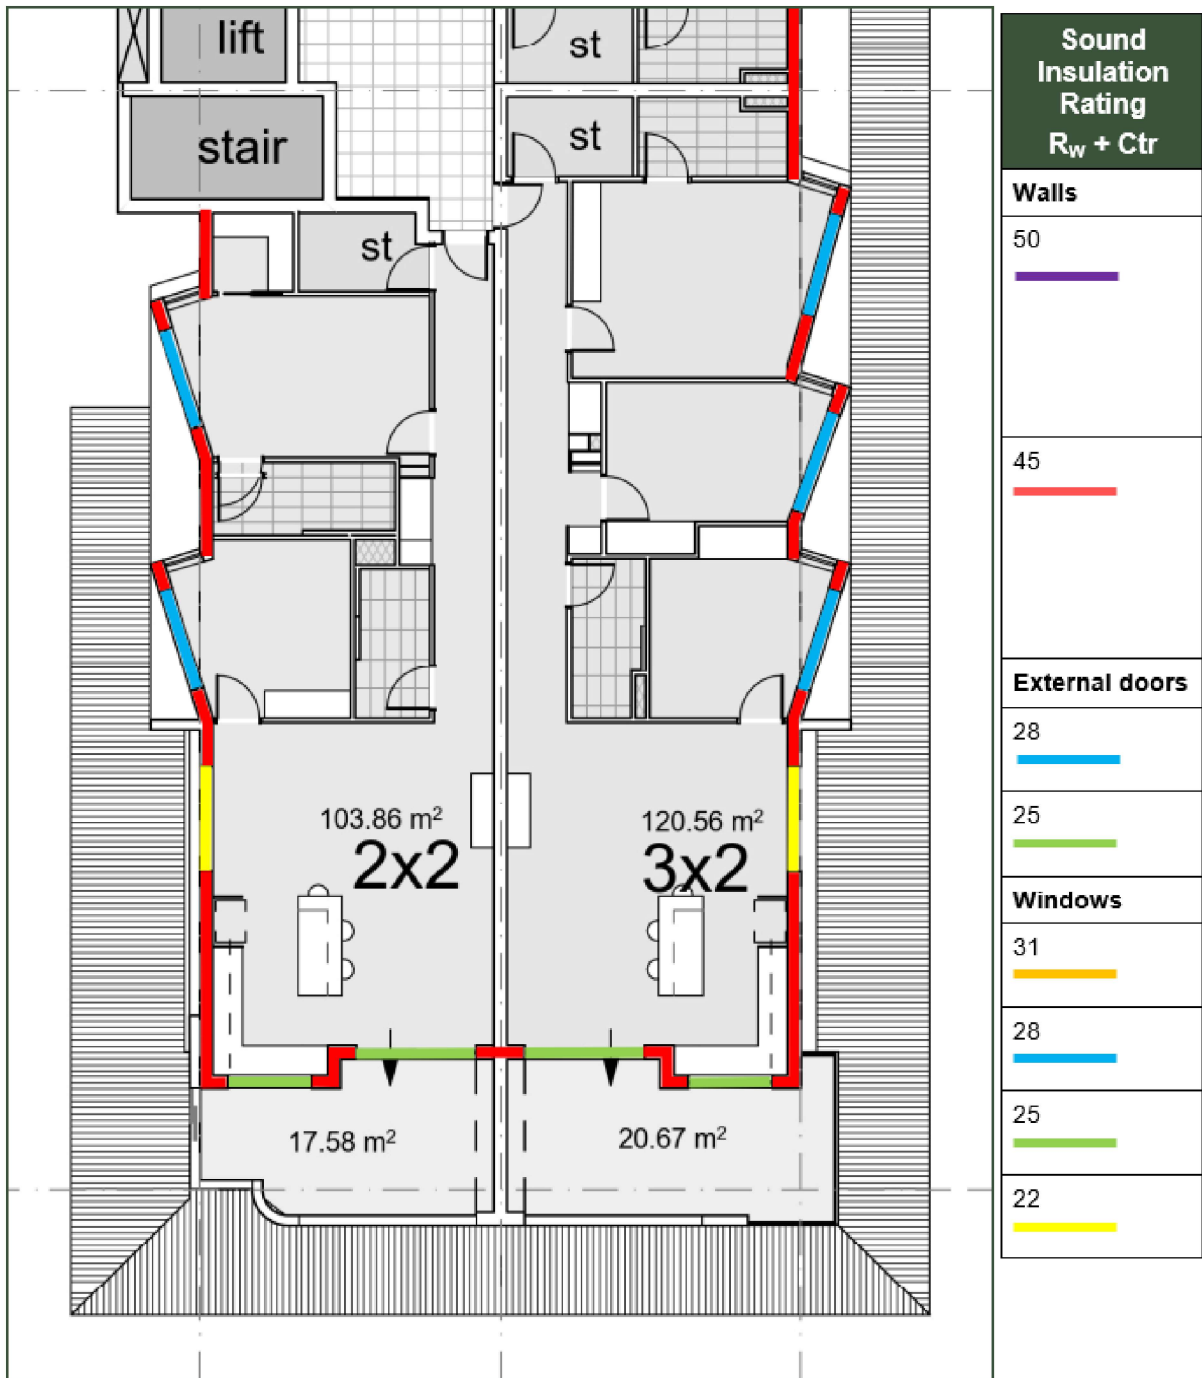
Building elements acoustic markup - Level 3 to 5, north side. Quiet House B.
